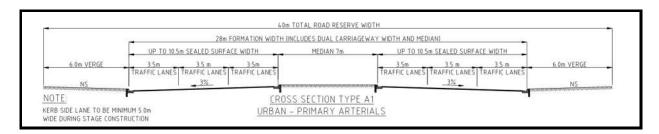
Standard NT Road cross section - Urban Primary Arterial Road
